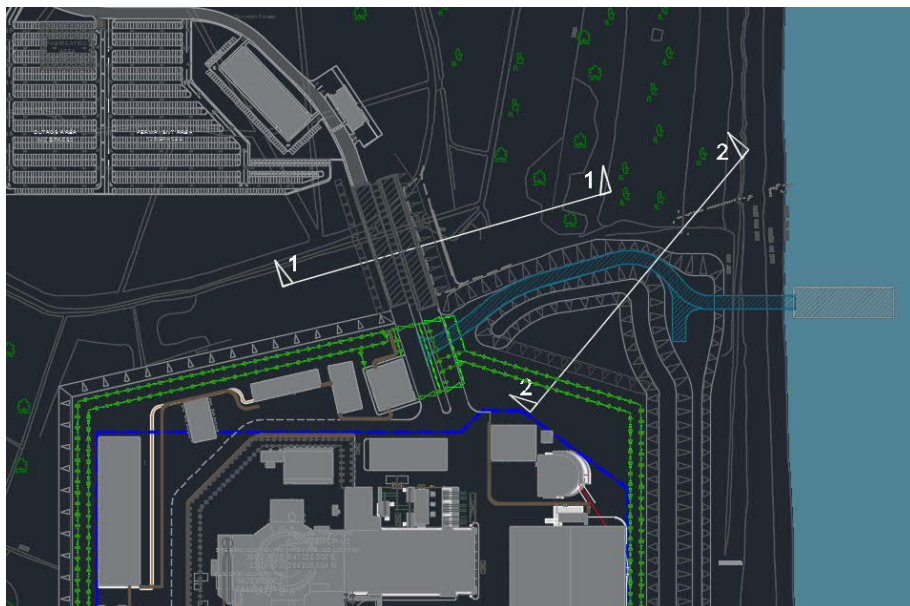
Location of SSSI crossing profile (section 1-1, extracted from SZC-SZ0100-XX-000-DRW-100031)
